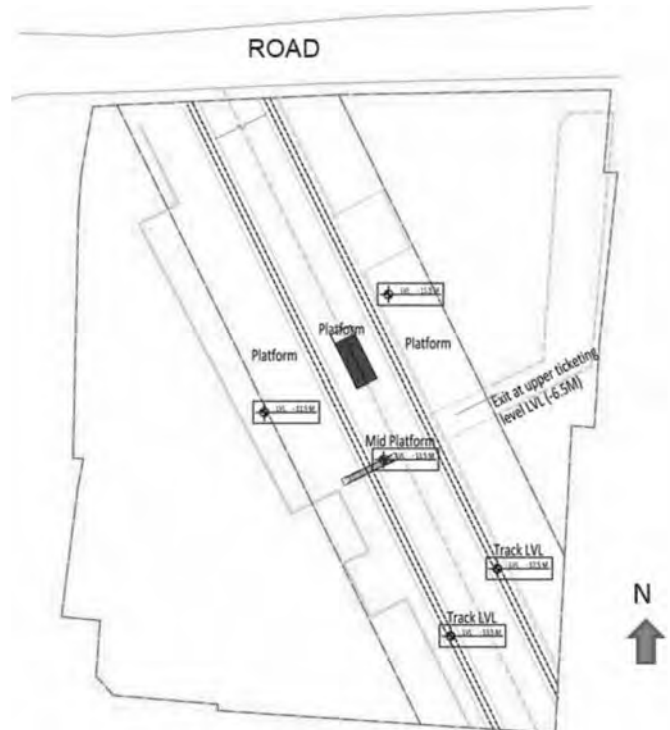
Site plan showing the layout plan of proposed underground metro station.
